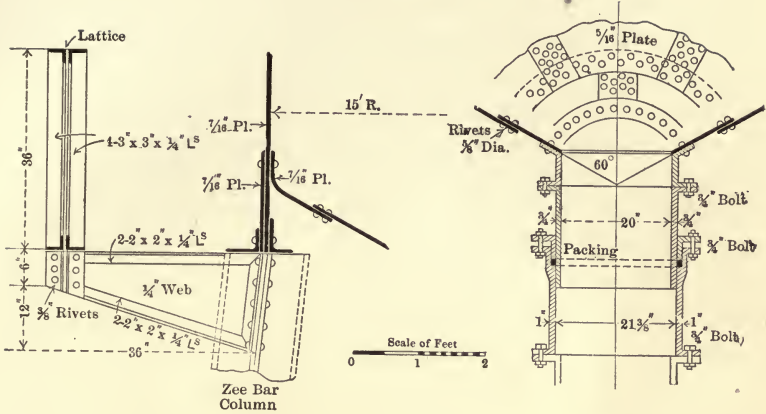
TANK DETAILS WATER-TOWER AT JACKSONVILLE, FLA.
